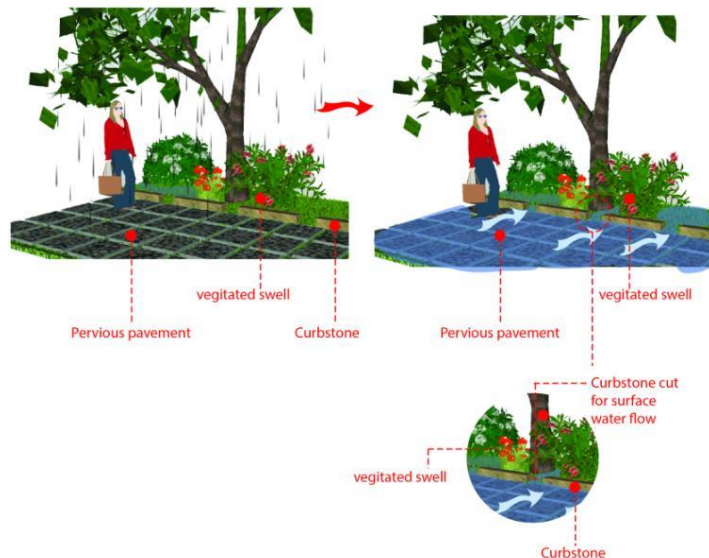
Movement of stormwater from pervious pavements to vegetated swales at roadside walkways (Author, 2020)
